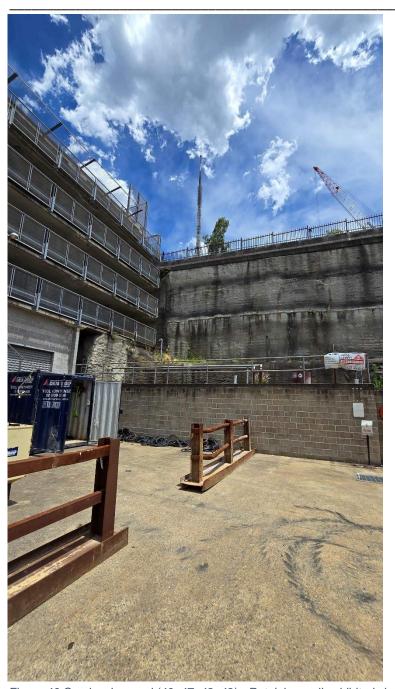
Cracks observed (46, 47, 48, 49) - Retaining wall exhibited signs of horizontal surface cracking
